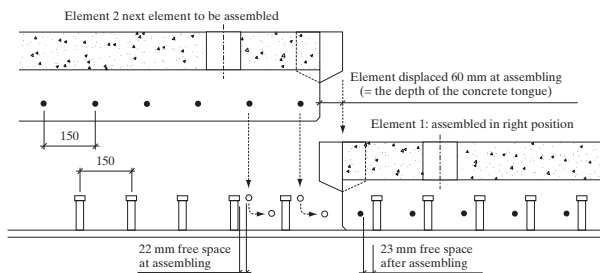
Illustration of the narrow tolerances at assembling (Units: mm)
